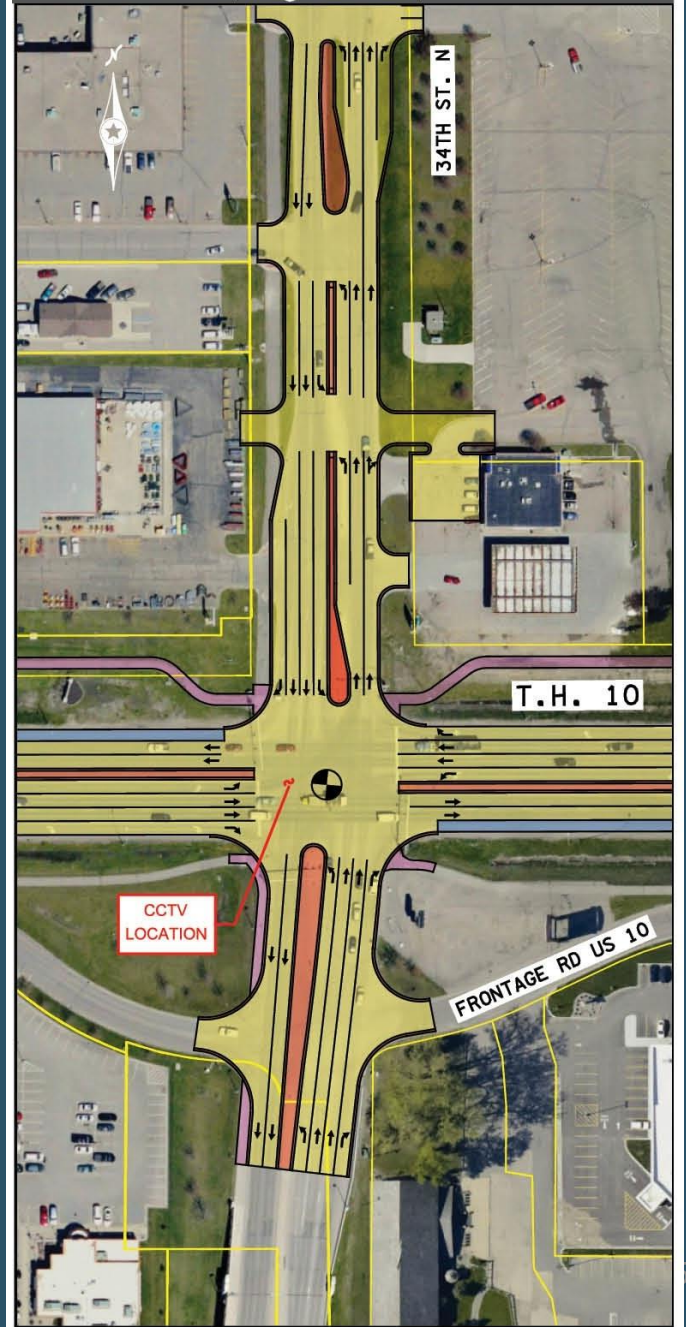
TH 10 Build Subalternative 34th Street (Segment 3)
